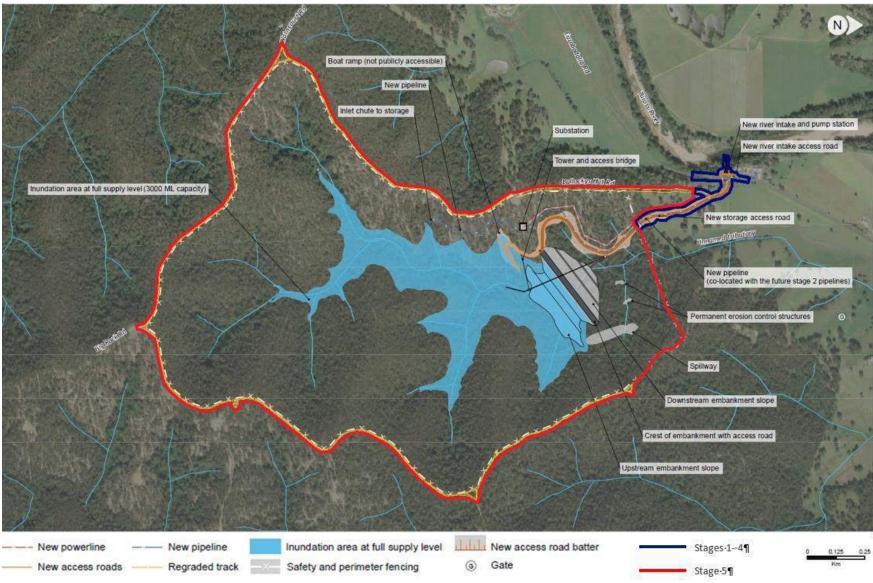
Project overview and scope of works covered by this plan (Stage 5)
